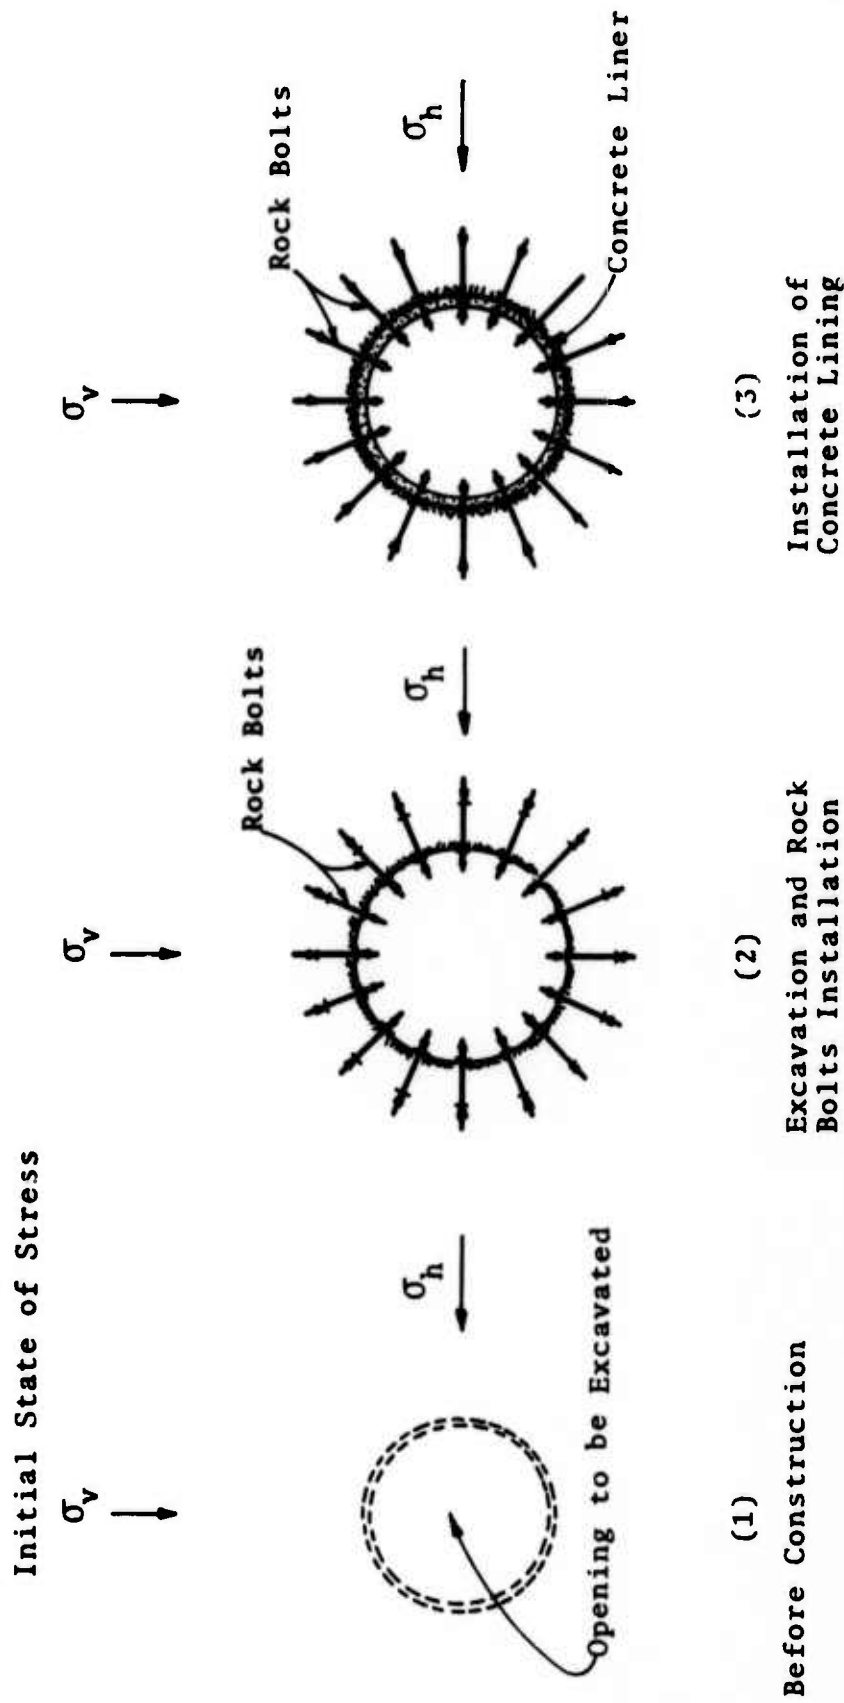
ASSUMED CONSTRUCTION SEQUENCES OF A CIRCULAR OPENING REINFORCED BY ROCK BOLTS AND A CONCRETE LINING
